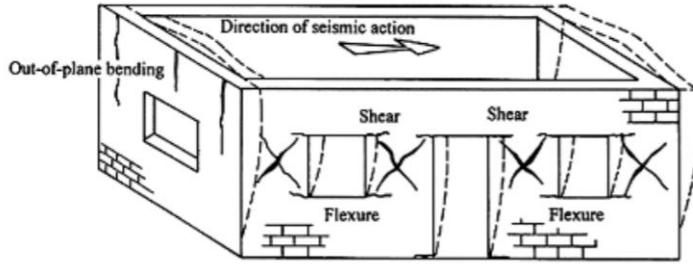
Deformation of a masonry building and typical damage to structural walls [14]
